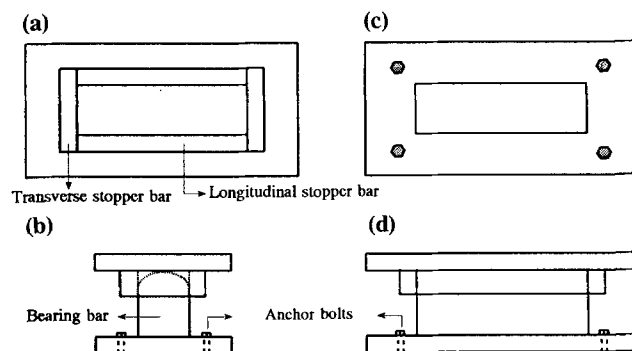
Typical Fixed Sliding Bearing: (a) Top Plate; (b) Side View of Bearing; (c) Bottom Plate Plan View; (d) Front View of Bearing
